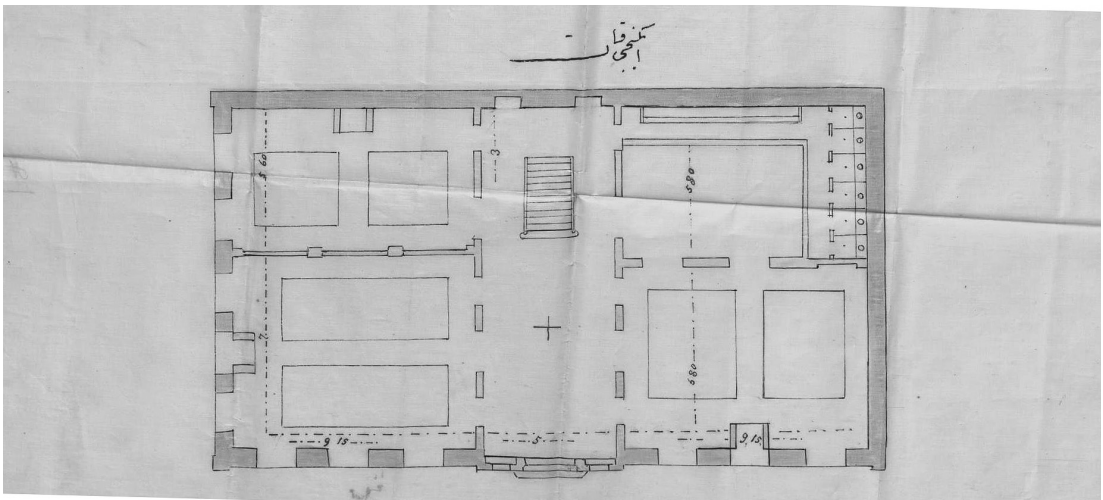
Drawing plan of the first floor; BOA., İ.AZN., 4033, leaf 3.
